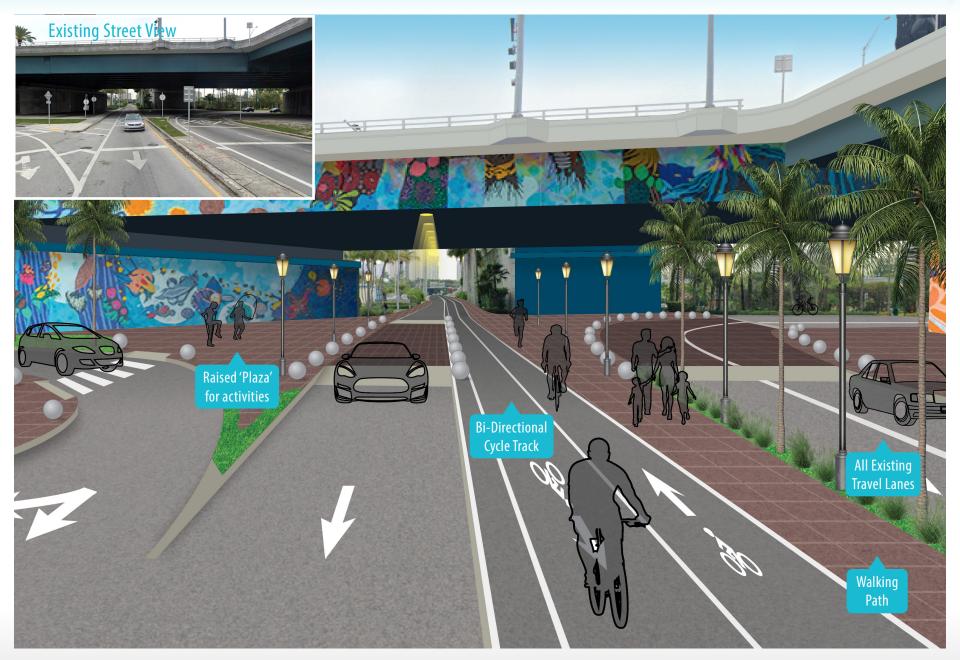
Proposed Recommendations. View looking east along NE 203rd Street.
